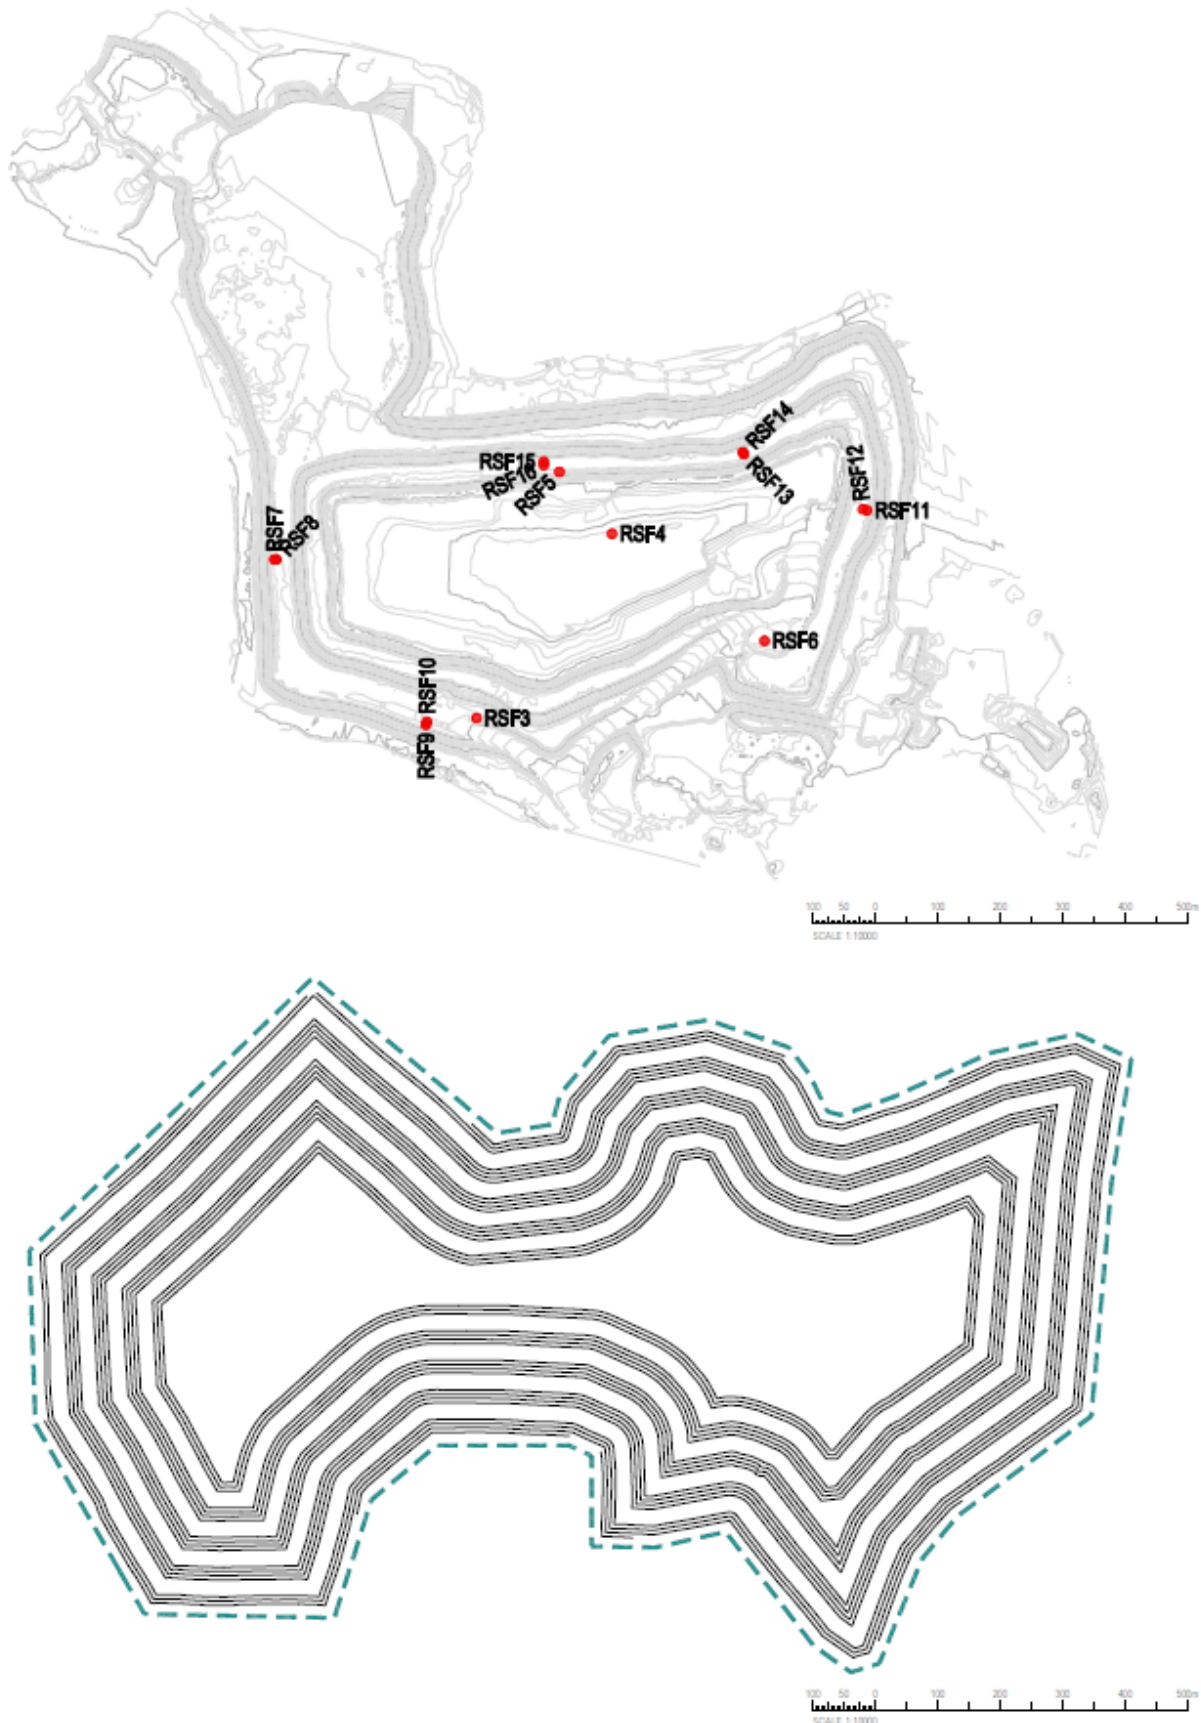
Portage WRSF (above) plan view, compared to Whale Tail WRSF (below) plan view.
